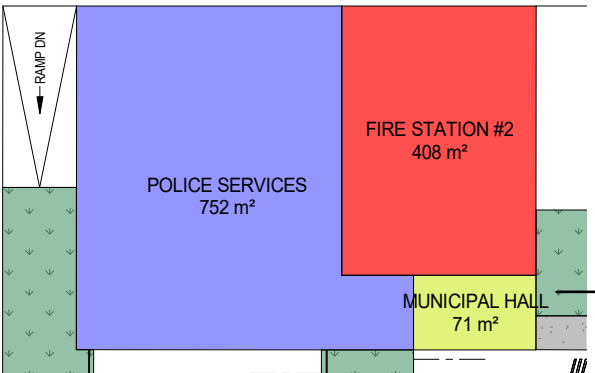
1903 Mt Newton Cross Road Site Concept: Site Distribution Option 1
